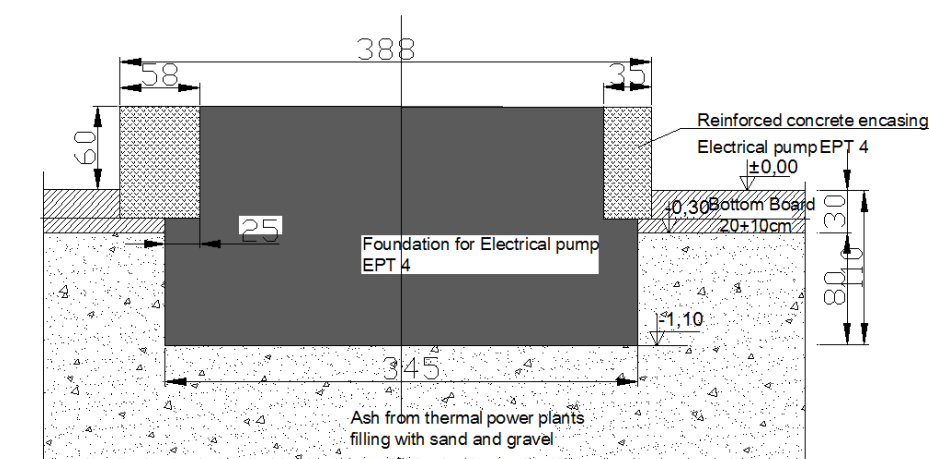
Foundation block EPT 4 – longitudinal section.
